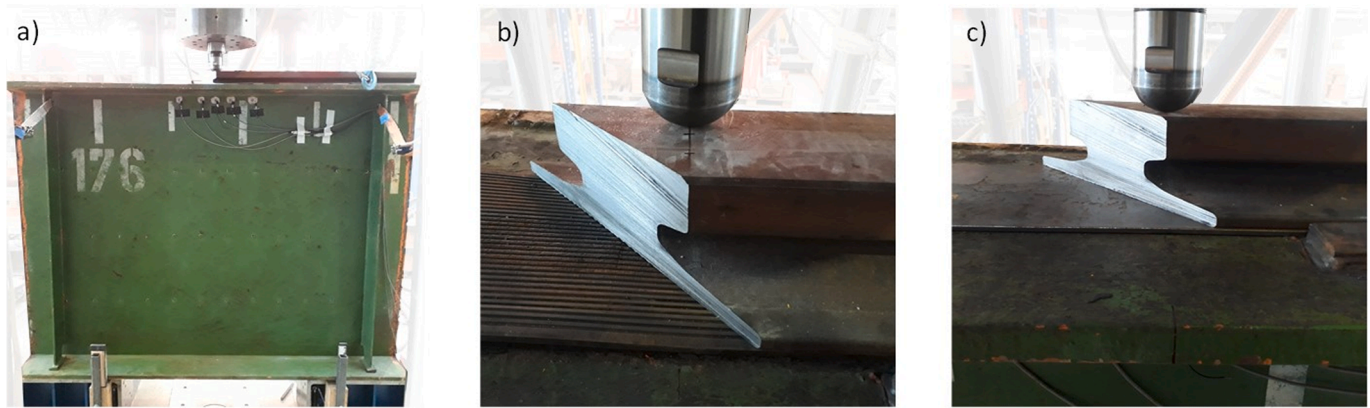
a) Test girder and rail with bevel joint in testing machine, b) rail with bevel joint on elastomeric bearing pad, c) rail with bevel joint on steel bearing plate.
